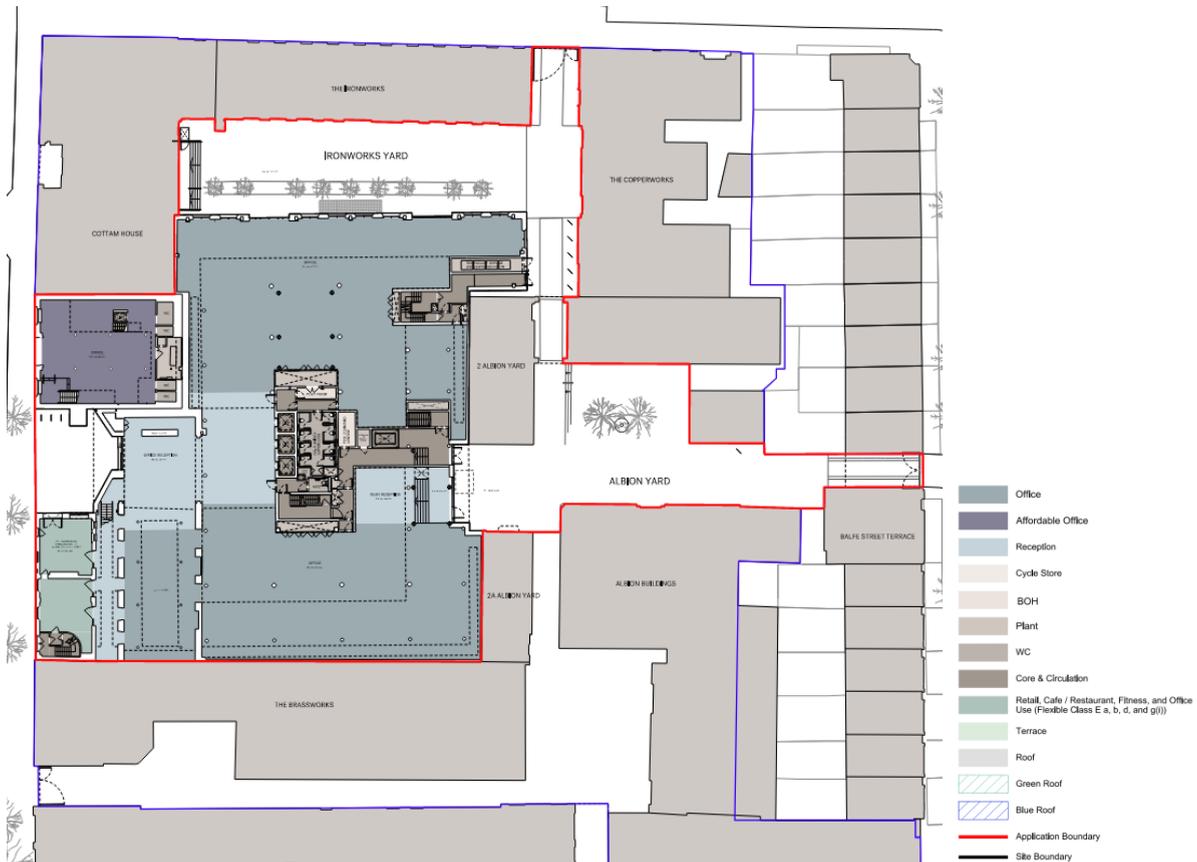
Proposed Ground Floor Layout and Uses – 34 York Way, Jahn Court and 34b York Way
